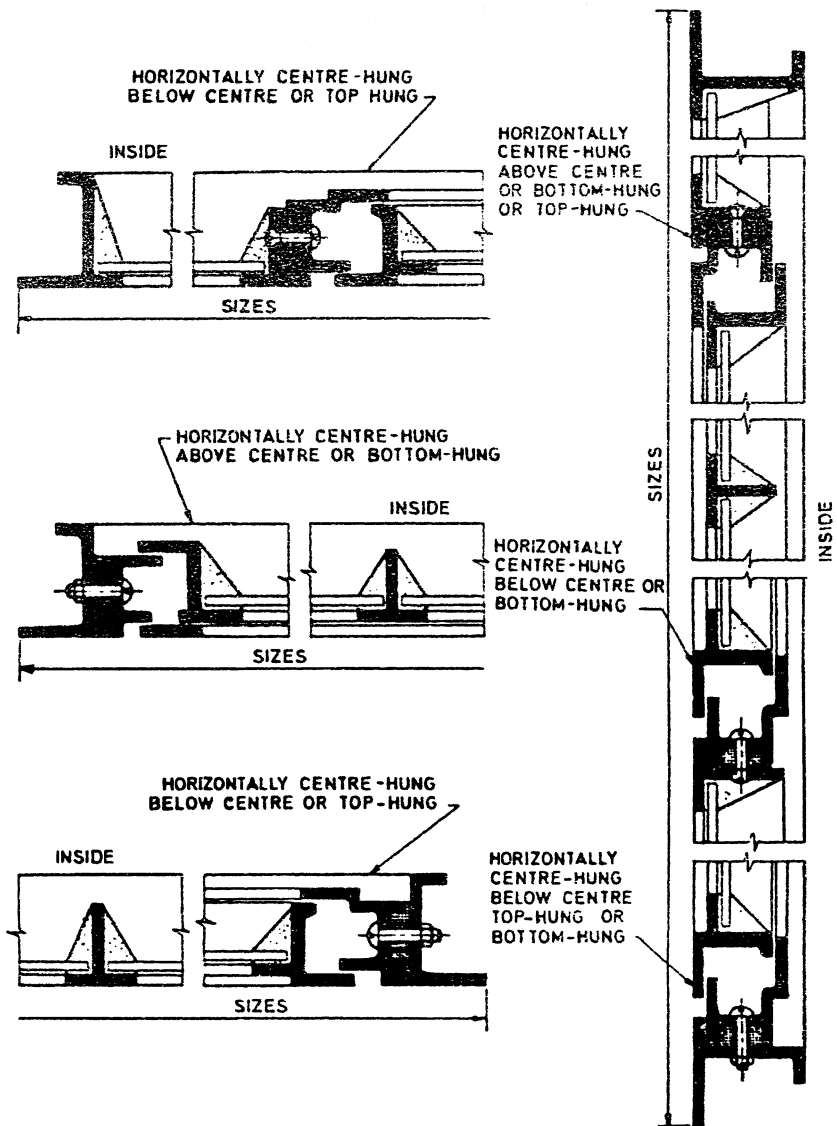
SECTIONAL DETAILS THROUGH SASHES
